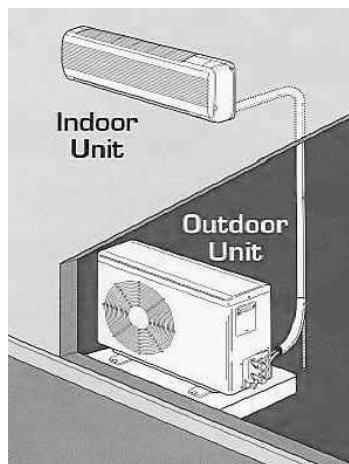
Layout of a ductless heating and cooling system (Gettum 2011)
